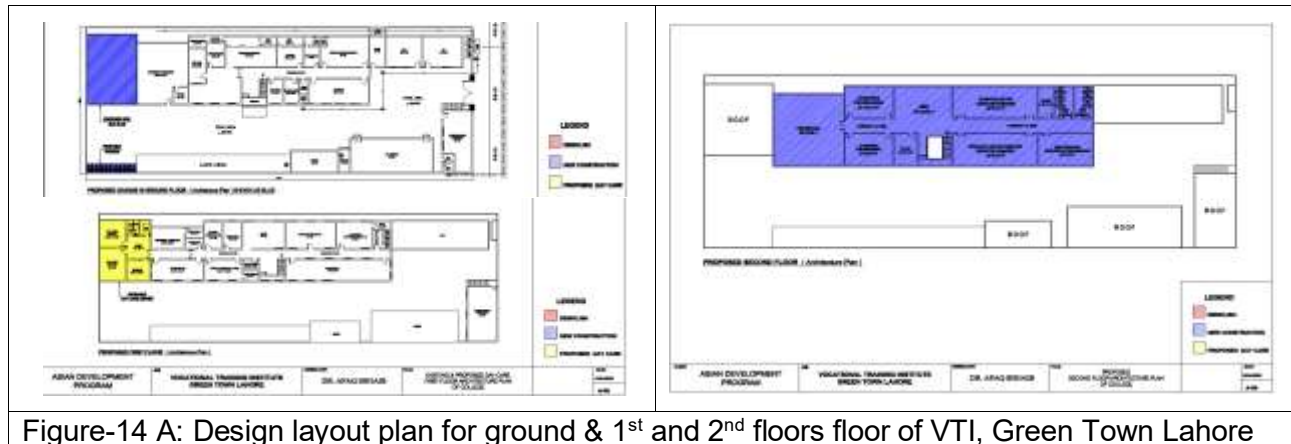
A: Design layout plan for ground & 1st and 2nd floors floor of VTI, Green Town Lahore
